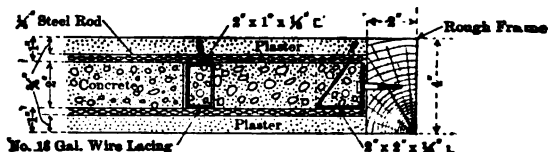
Four-inch Solid Plaster and Concrete Partition. Horizontal Section
